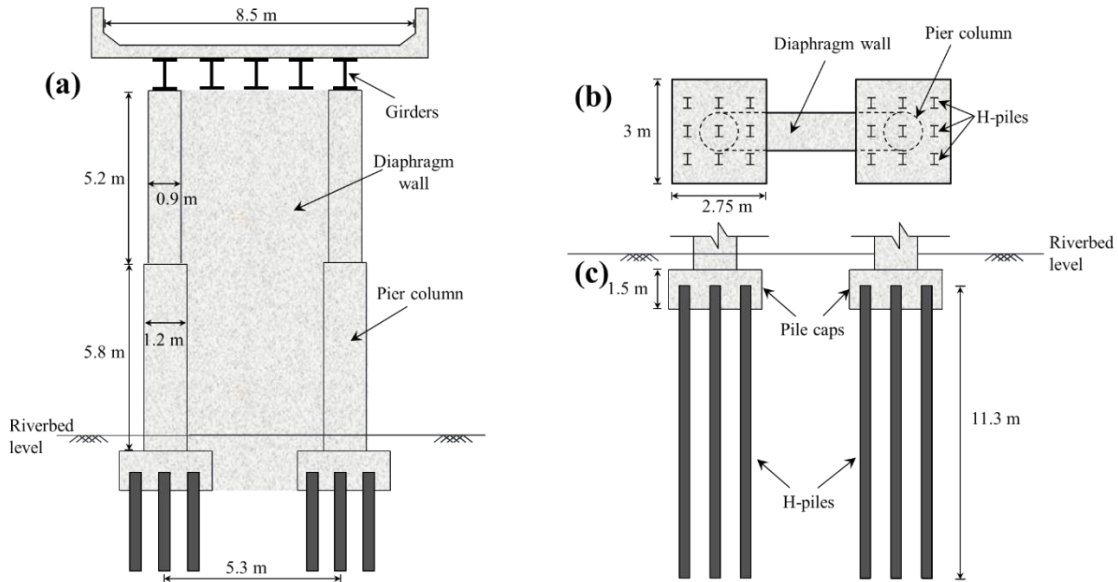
Layout of bridge pier with investigated pile configuration: (a) piers and superstructure; (b) plan view of pile caps; and (c) side view of pile caps and H-piles
